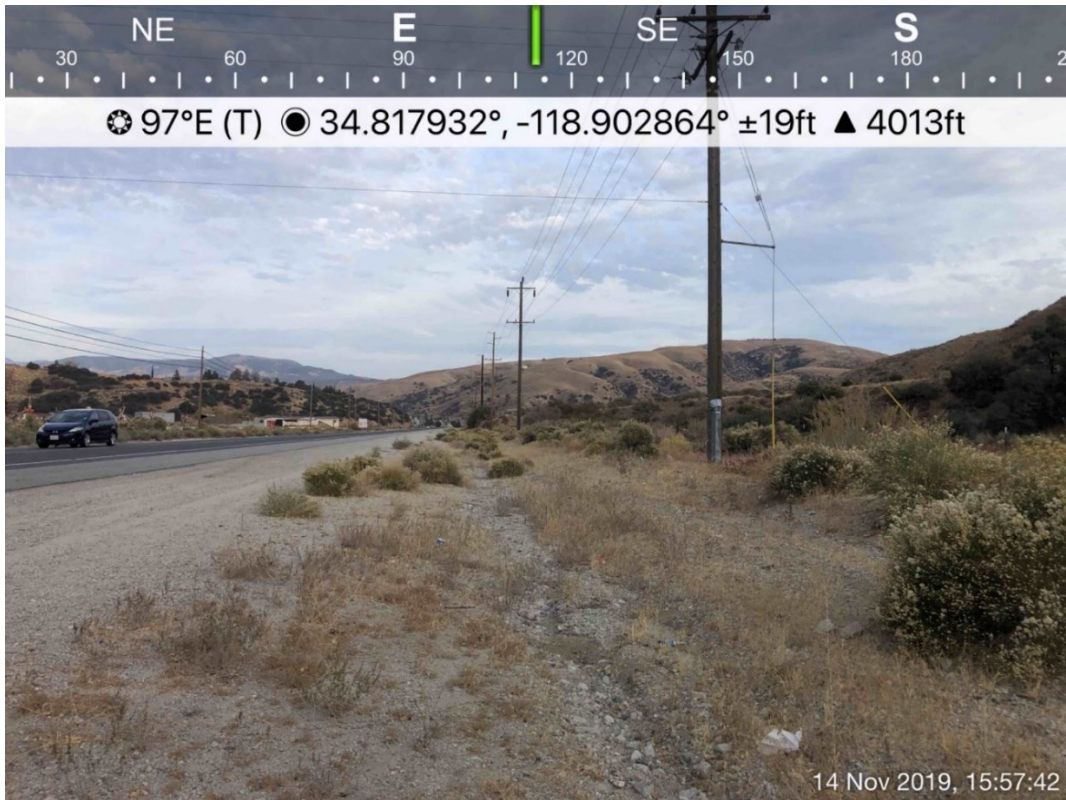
Overview of the Frazier Mountain Road alignment along the Cuddy Canyon Road right of Way.
